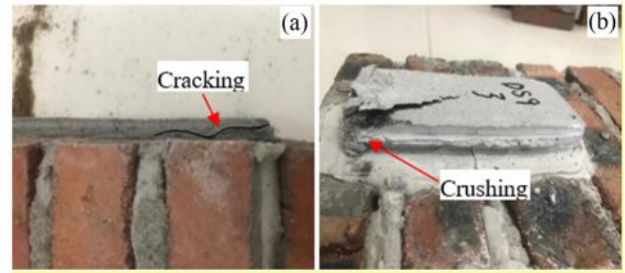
Double-sided shear test failure mode of reinforcement destruction: (a) Cracking of reinforced layer and (b) Crushing of reinforced layer.
